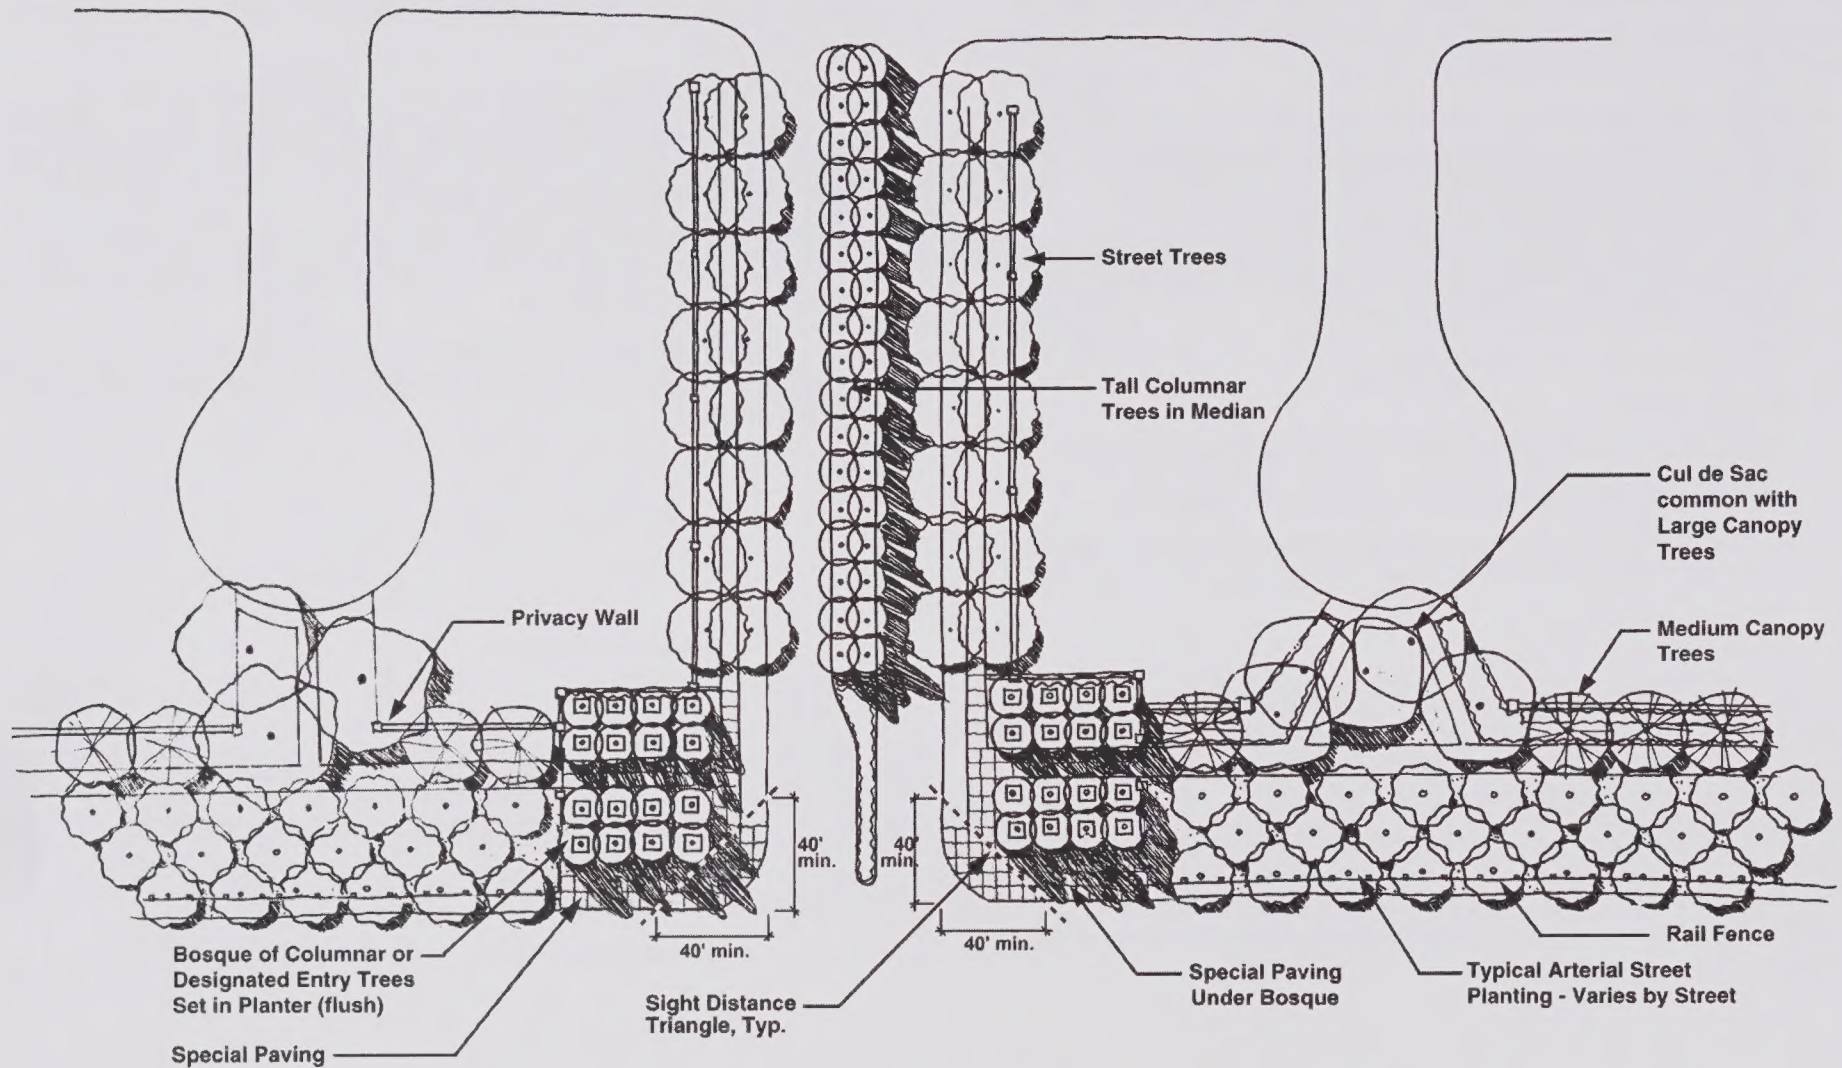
NEIGHBORHOOD ENTRY – PLAN
